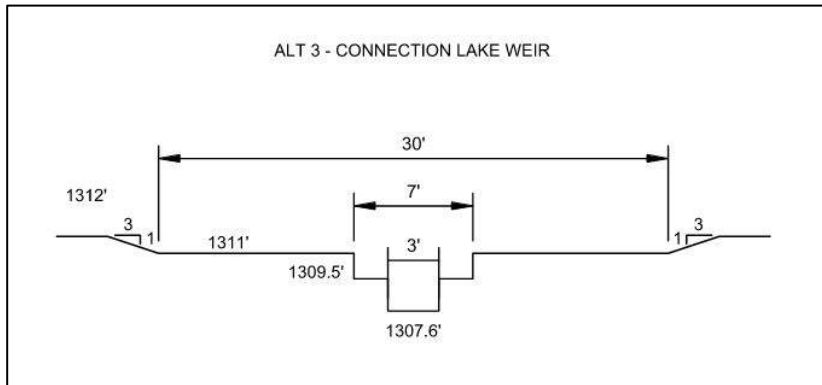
Alternative 3 Connection Lake Outlet Structure Layout
